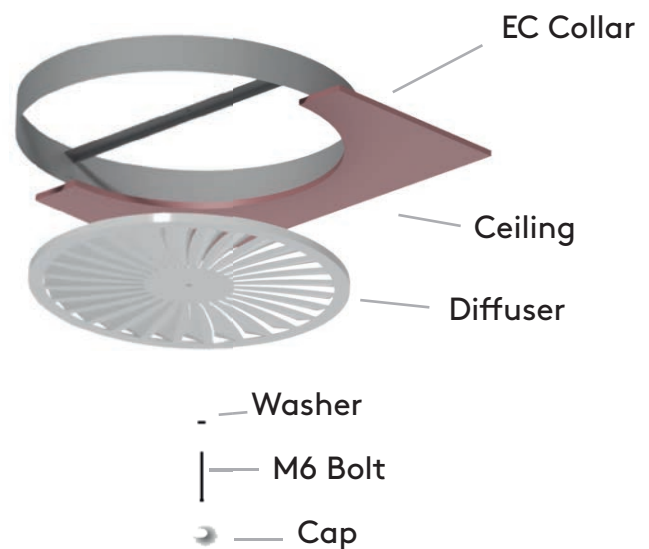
Showing solid ceiling installation with fixing collar for a non-duct return system.
